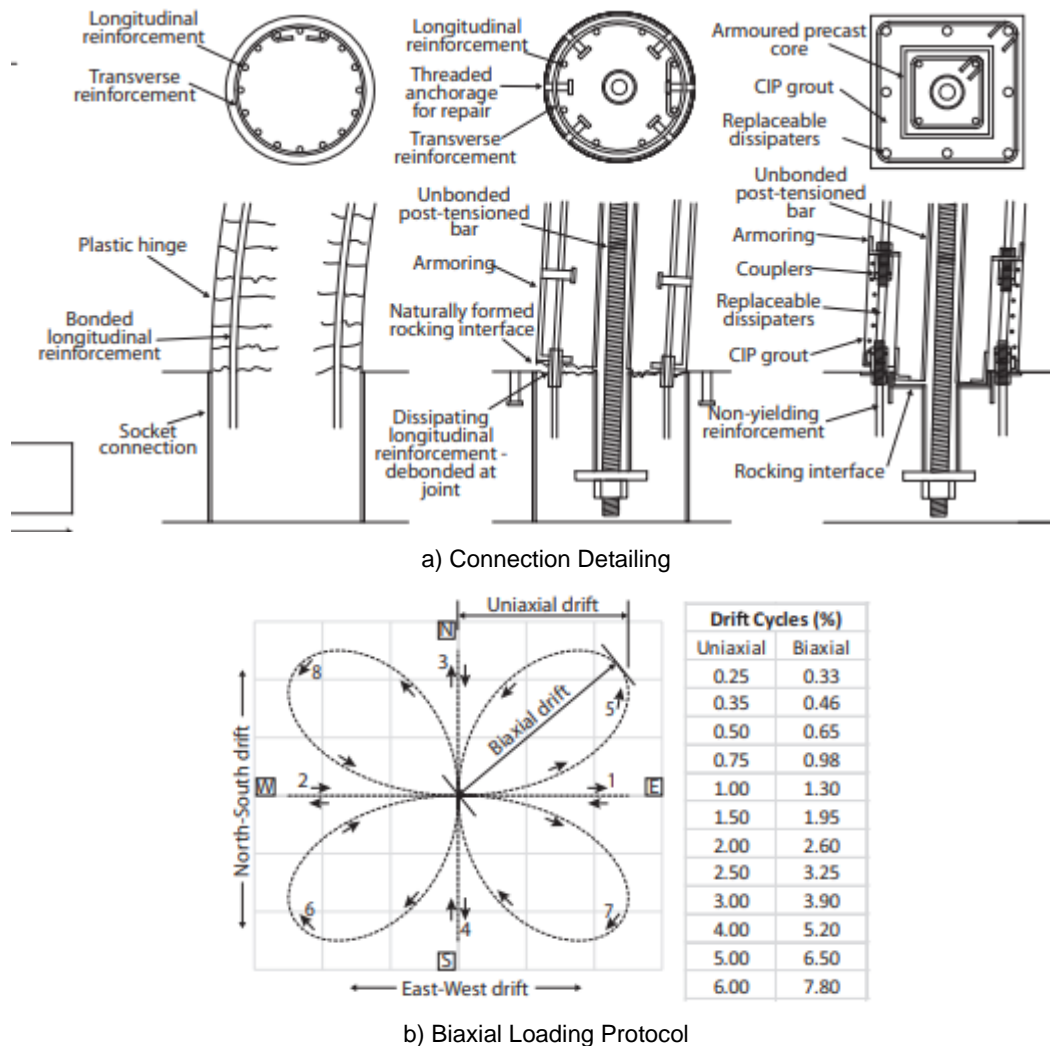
Connection Detailing and Biaxial Loading Protocol (White and Palermo, 2016)
